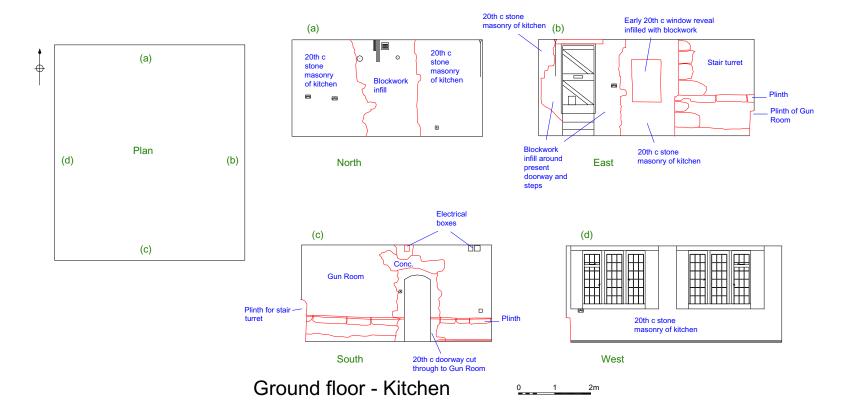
Annotated elevations of the tower interior: Ground floor Kitchen
